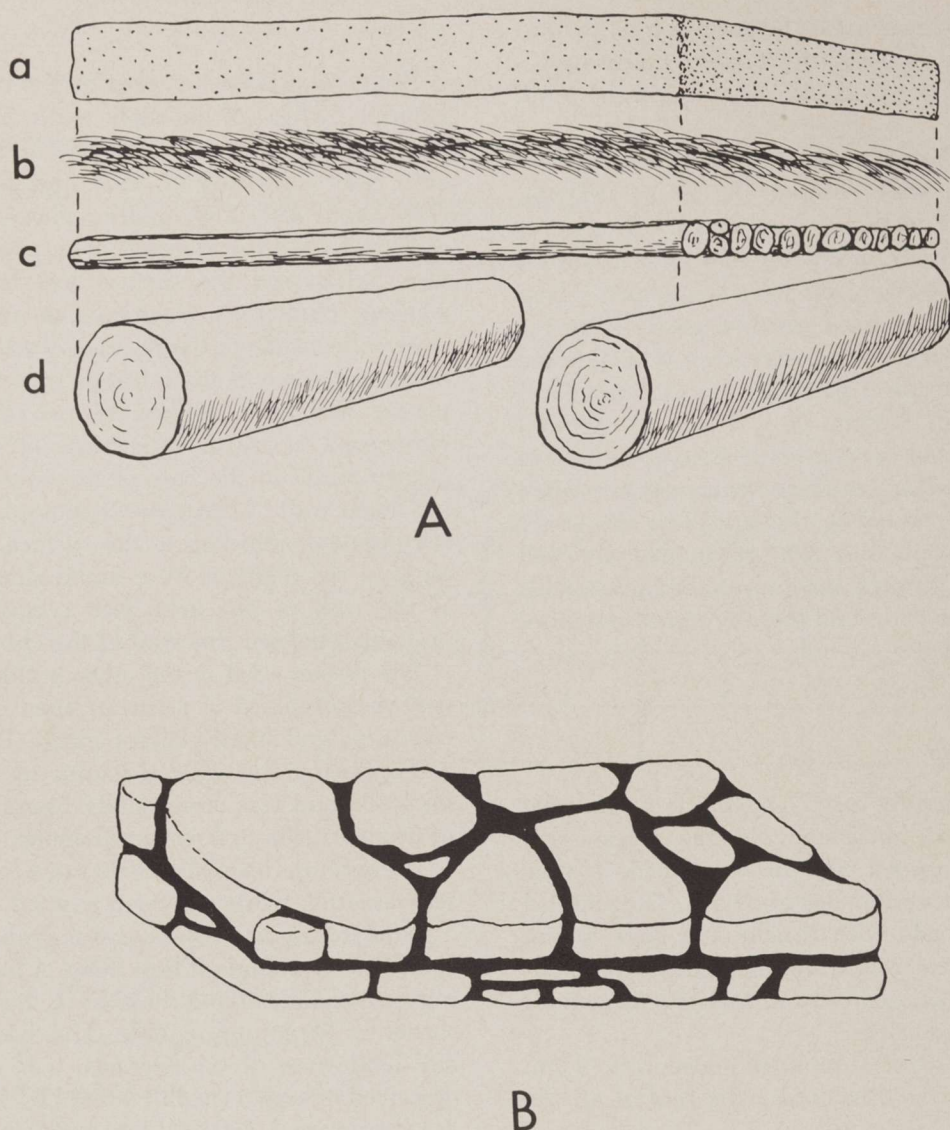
A. Details of roof construction: a, puddled adobe; b, grass; c, savinas; d, vigas. B. Details of stone wall construction.
